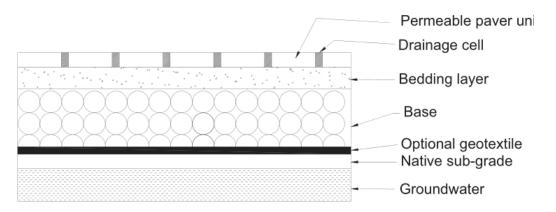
Typical schematic layout of a permeable pavement system. (Miklas Scholz, 2007)
